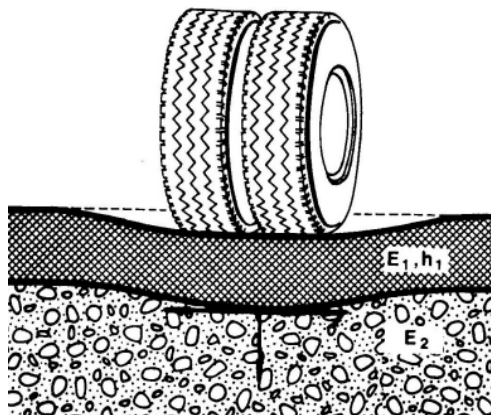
Scheme of mechanical behavior of flexible pavement structure under traffic load [6]
